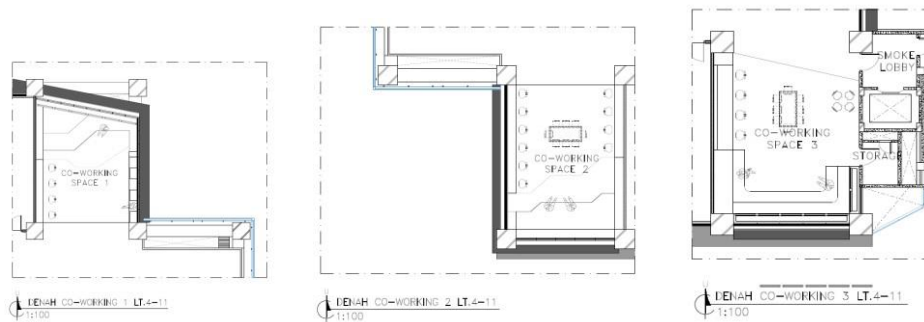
Co-Working Space 1, 2, and 3 Layout
